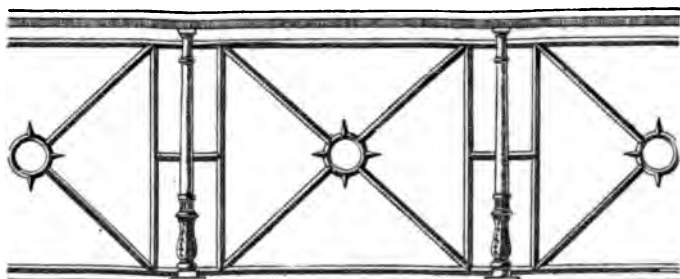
Barrier for Dividing Rooms (Section 181).
